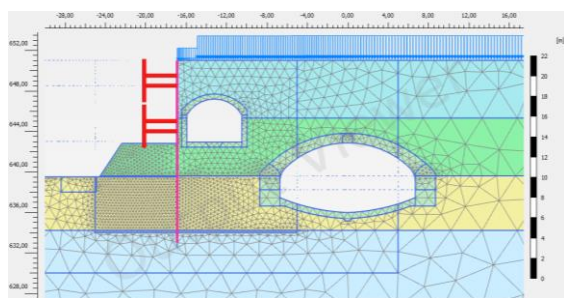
Plaxis Section 6 (strutting system, earth berm).
